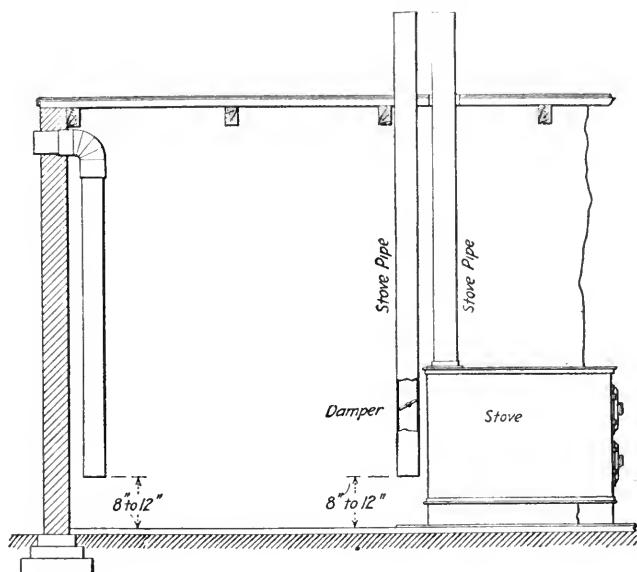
ARRANGEMENT OF AUXILIARY VENTILATING PIPES.
